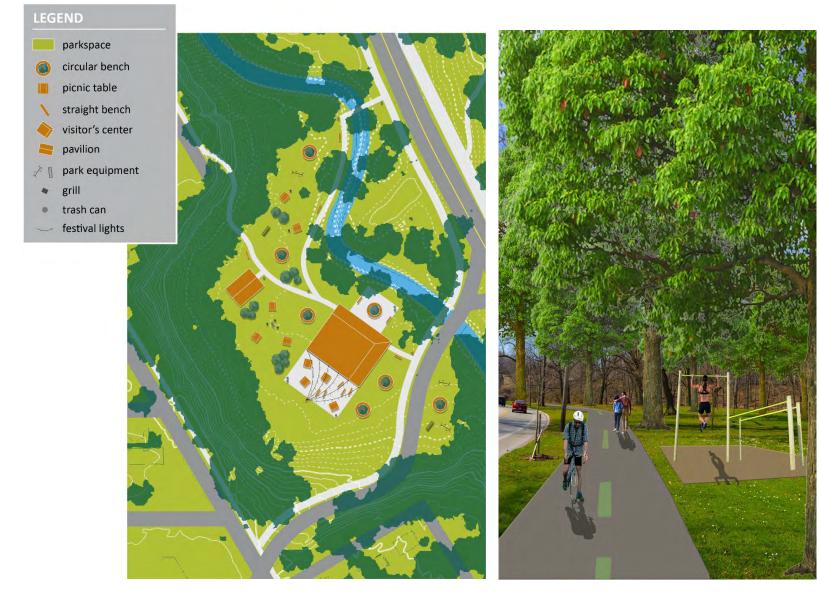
Proposed Site Plan Aerial Image, Sowinski Park
